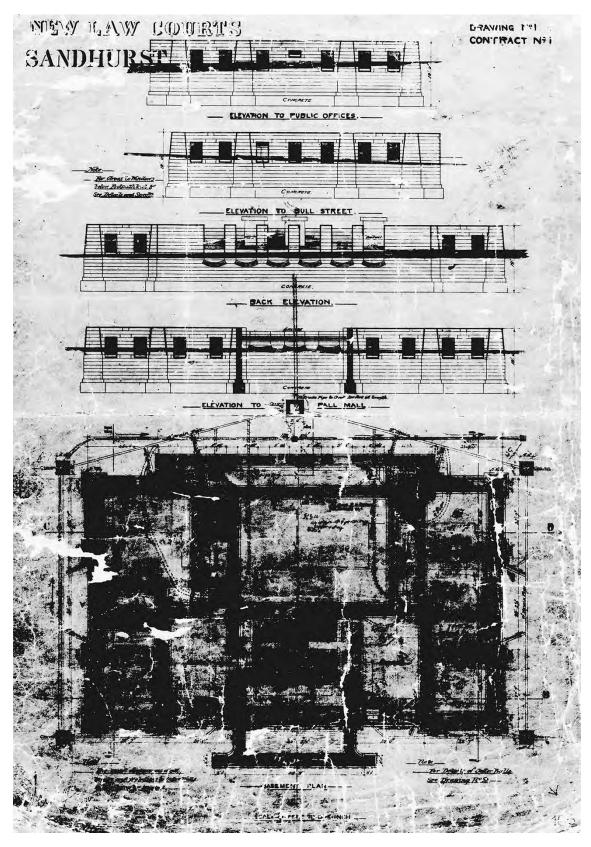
New Law Courts Sandhurst Drawing No. 1, Contract No. 1 Source: Public Works Department, PROV LCB 10.3
